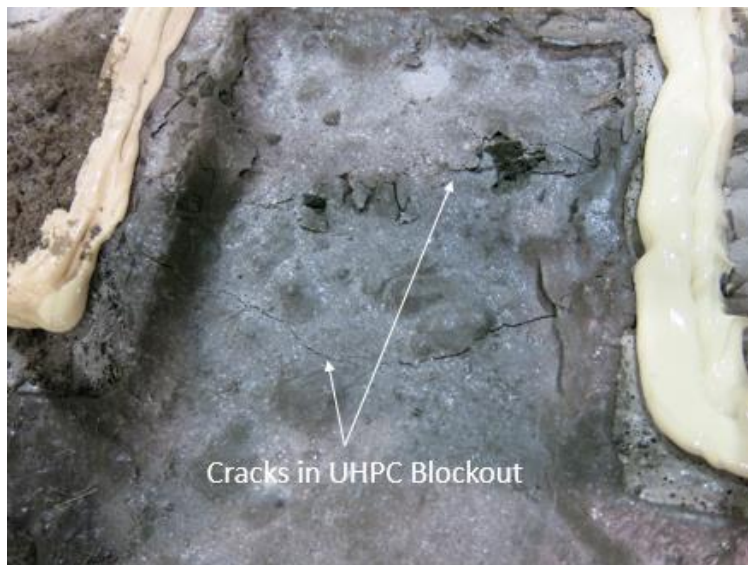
Picture looking down on UHPC blockout showing cracks run across the blockout
